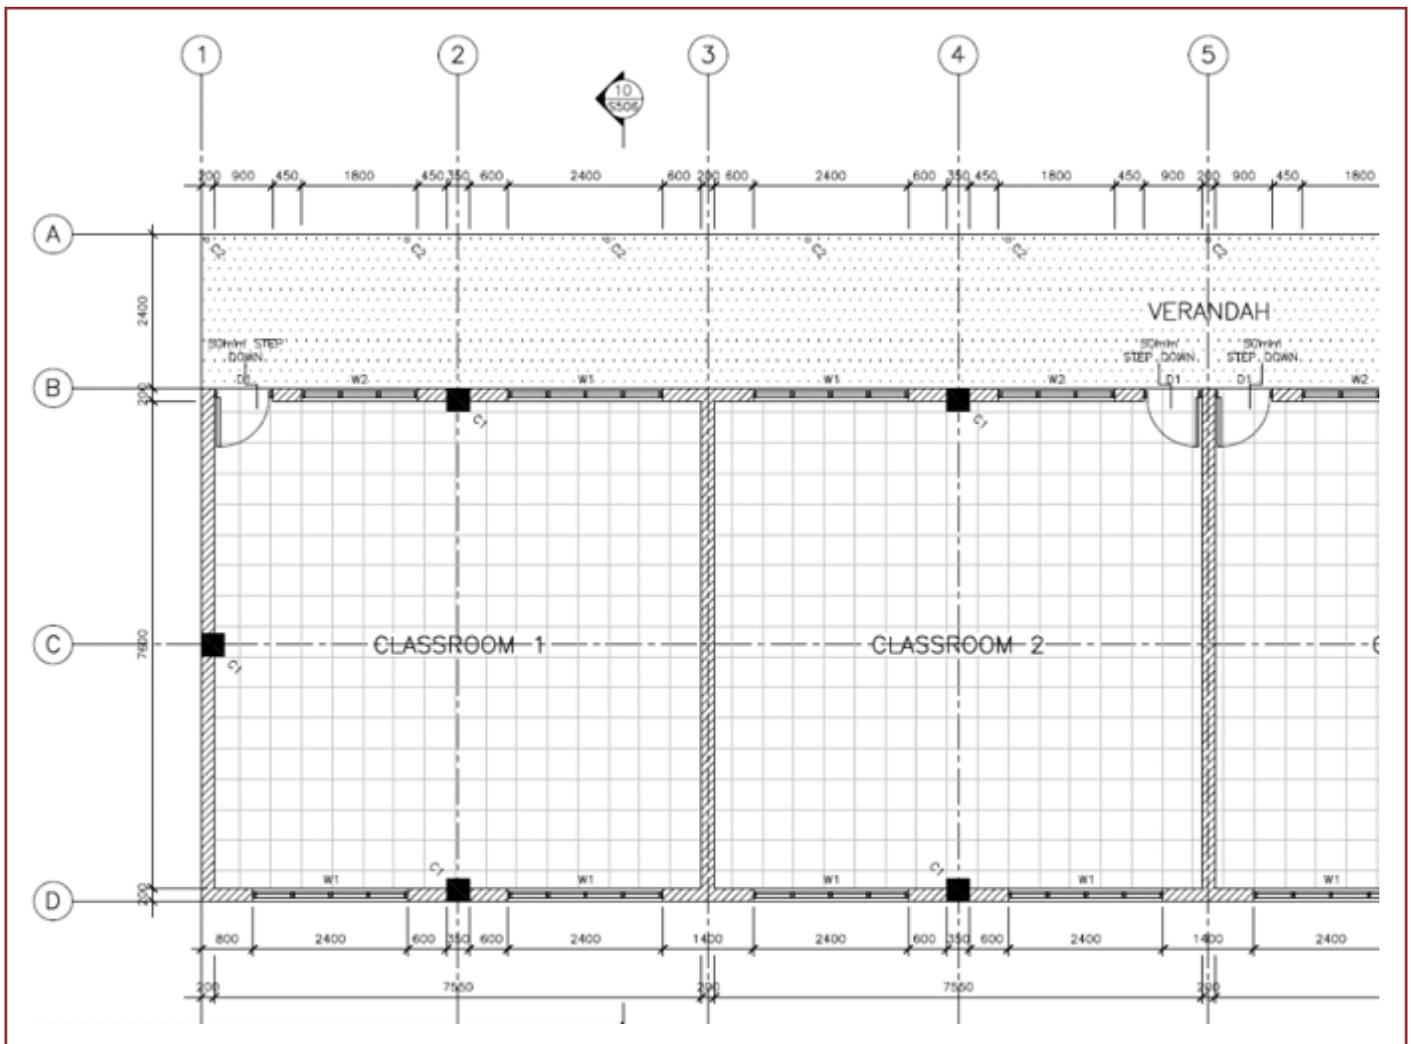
Part floor plan, New Classroom Building, Nailuva District School (Source: Construction Implementation Unit, Ministry of Economy, Fiji)
